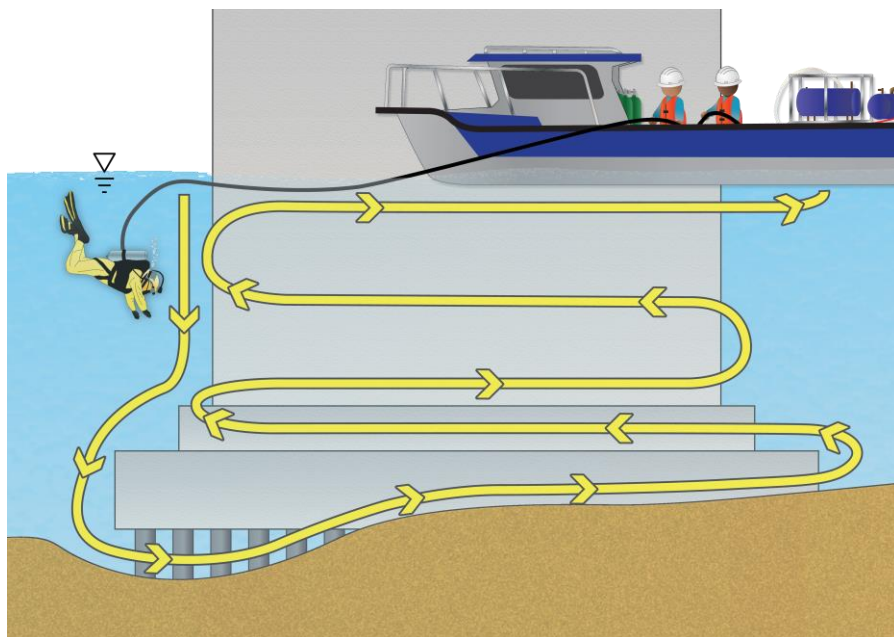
Illustration. Inspection pattern for pier wall with footing and seal.
